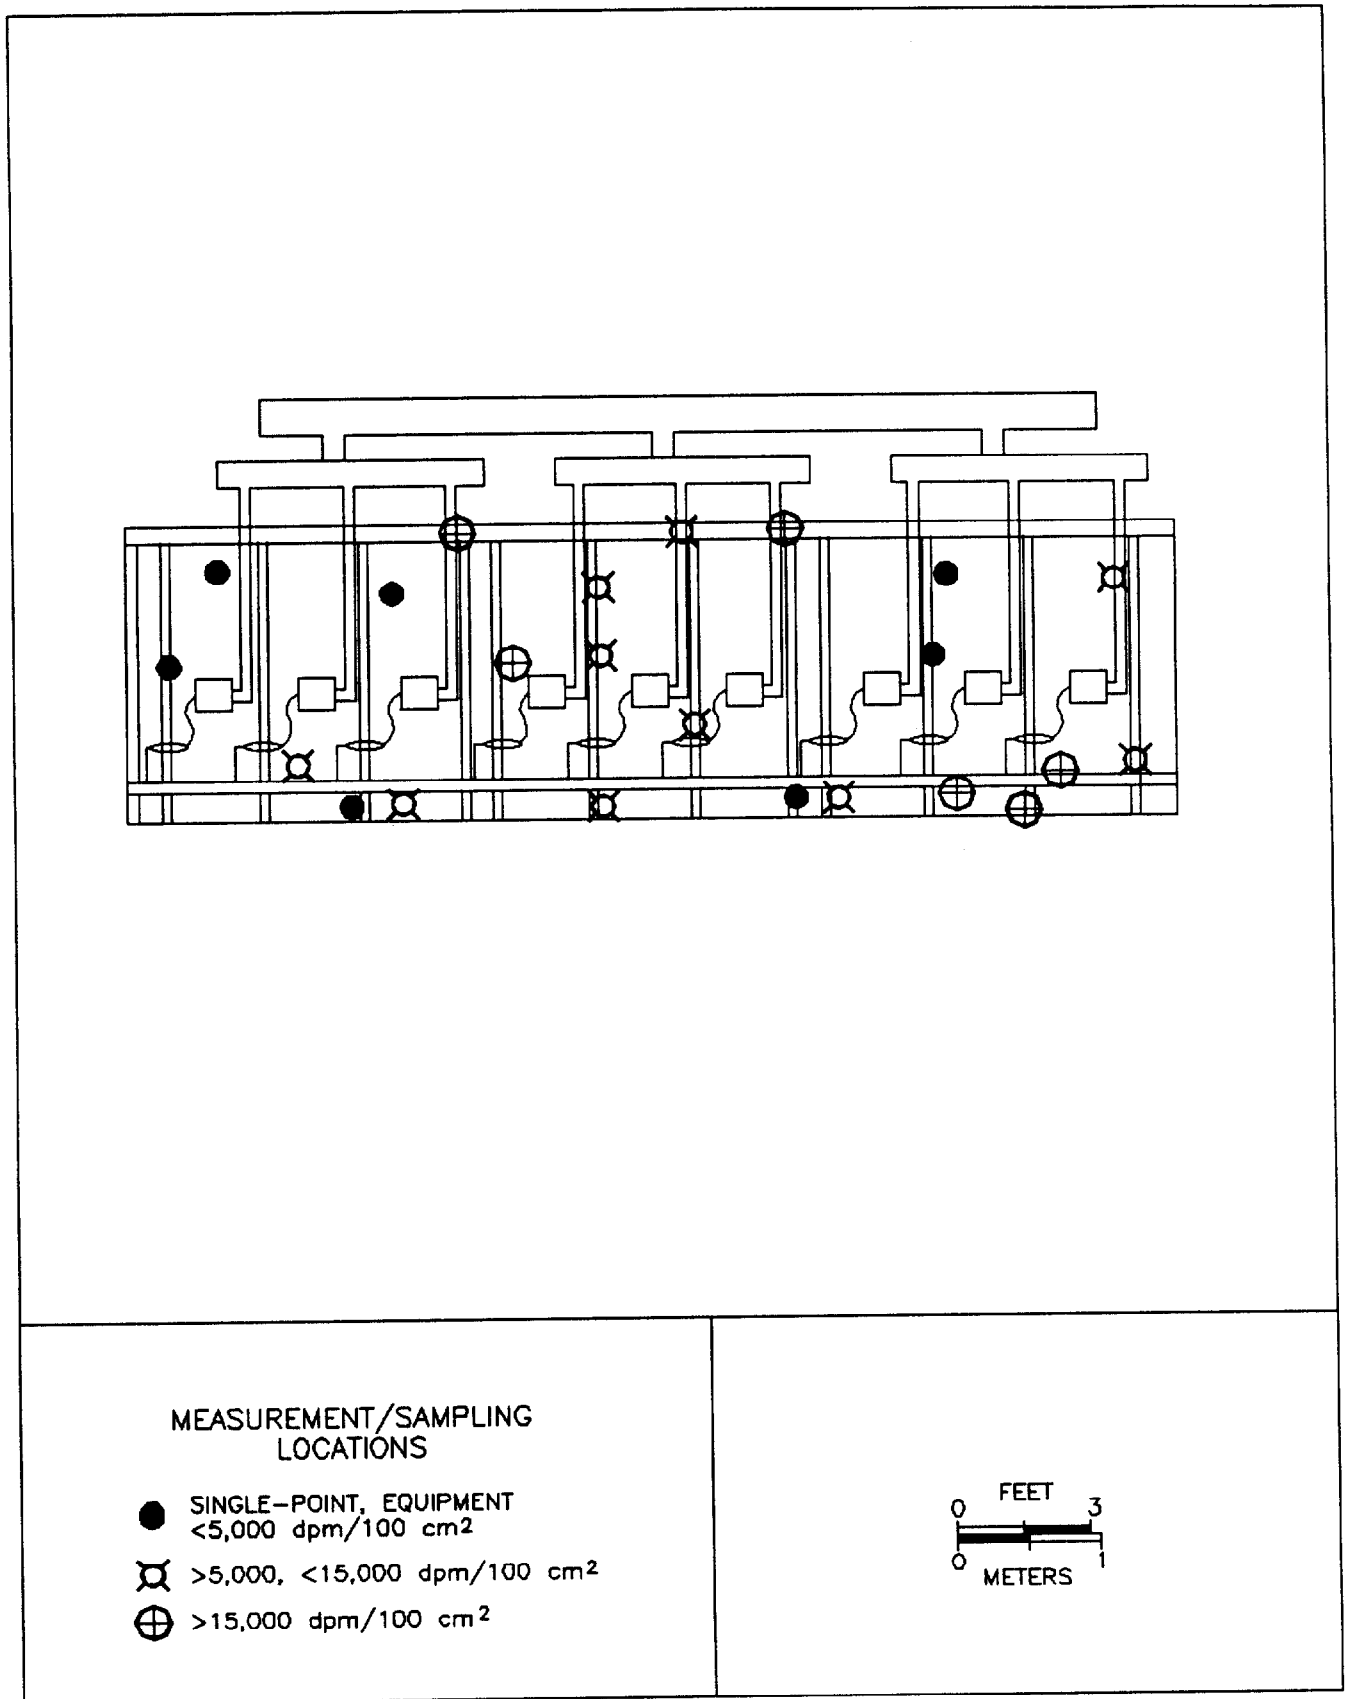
Building 3, East Furnace, West Face – Measurement and Sampling Locations
